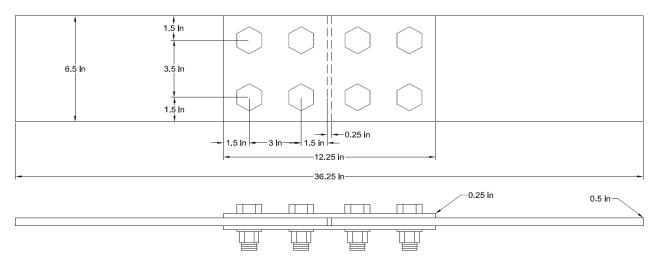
Dimensions of the ¹/₄ in. gap splice connection specimen.
